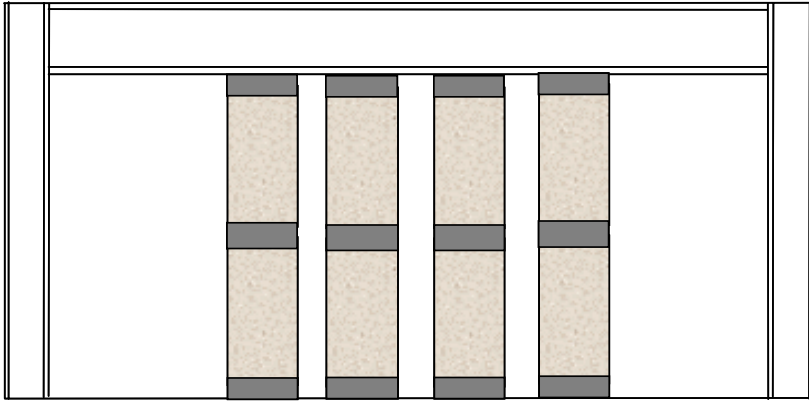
Schematic of frame with 4 beam-type infill sections added (*not to scale*)
